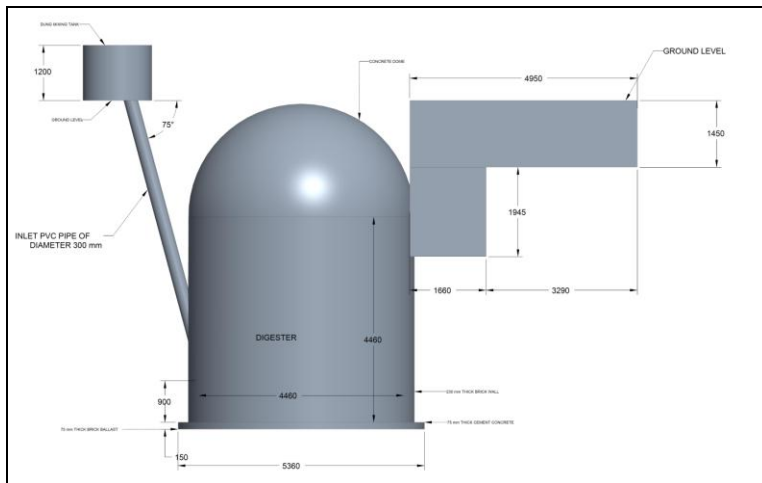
Installed 50 m³ modified Janta fixed dome biogas plant
